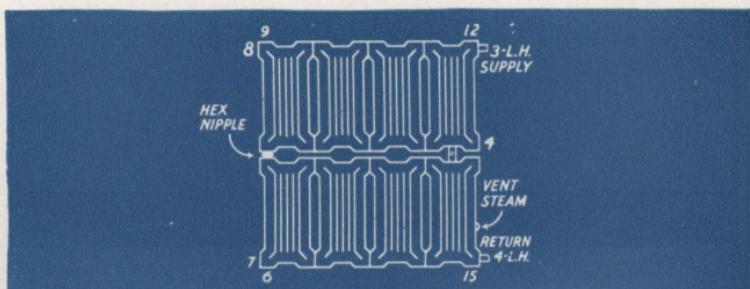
Assembled in single tier. For water or one and two pipe steam.
